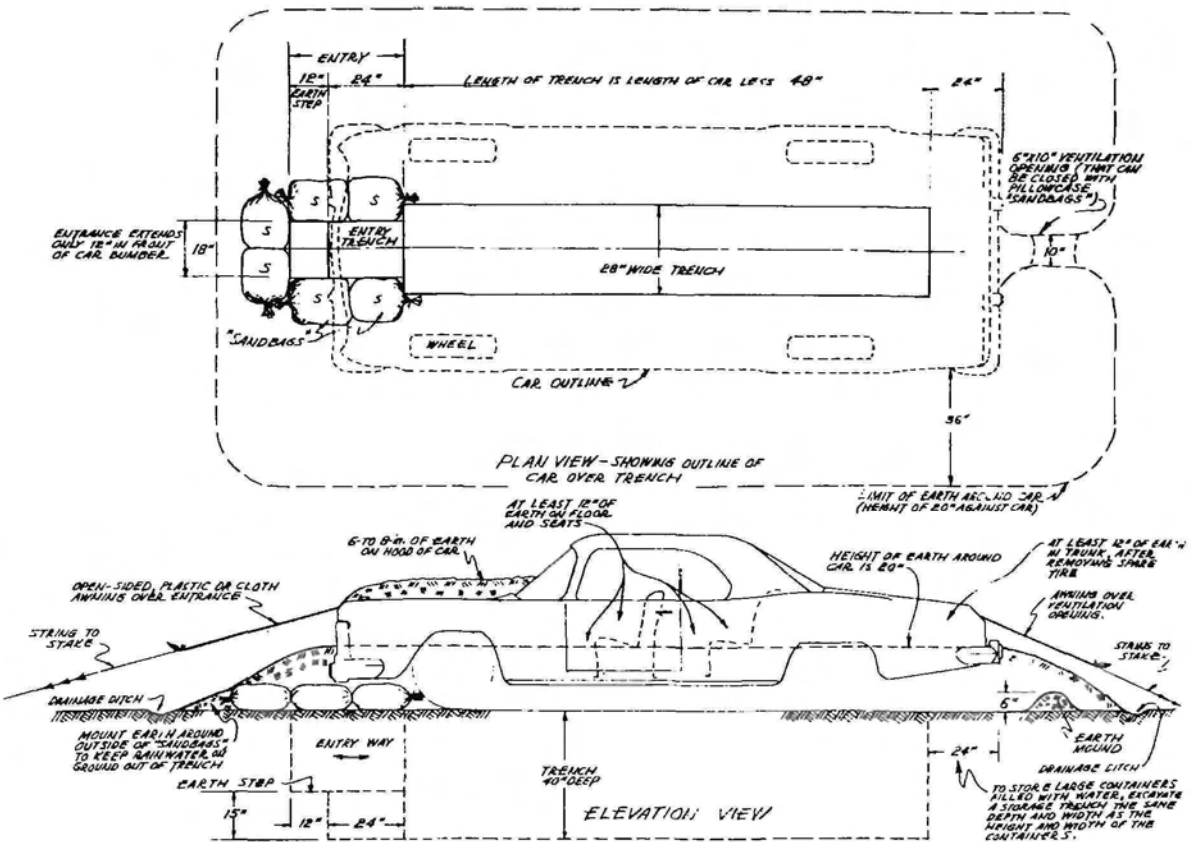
Plan and elevation of the Car-over-Trench Shelter.
